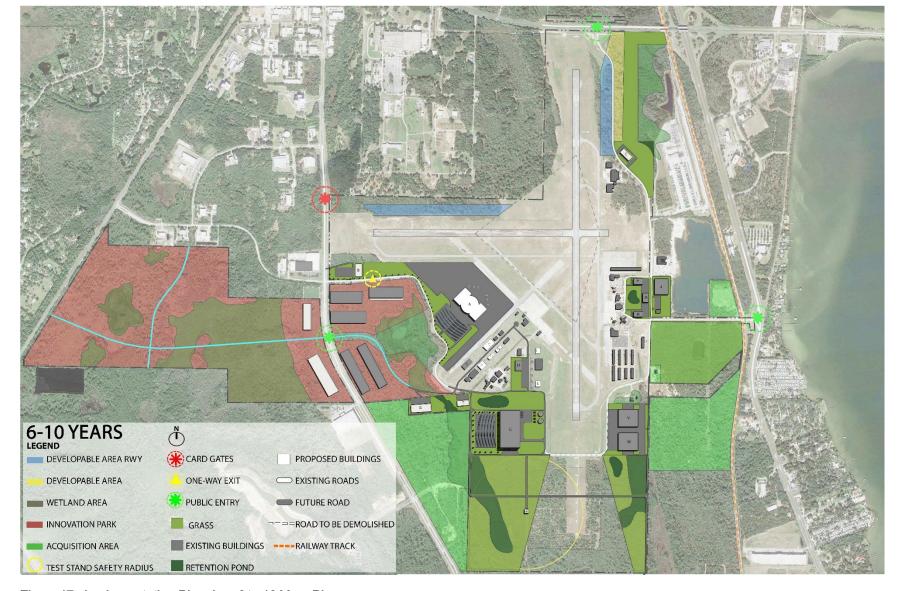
Implementation Planning – 6 to 10 Year Plan
